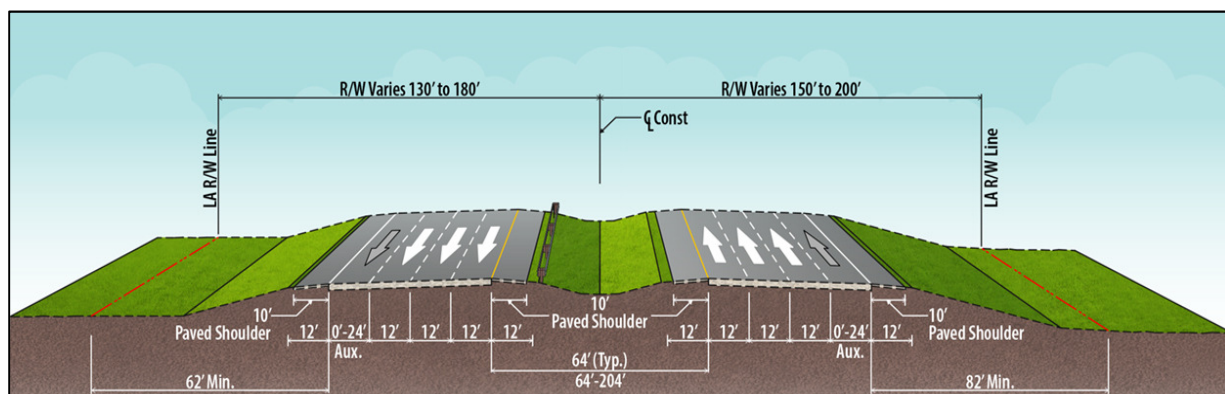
Existing I-275 Mainline Typical Section from I-175 to south of Gandy Boulevard (Segment B)
